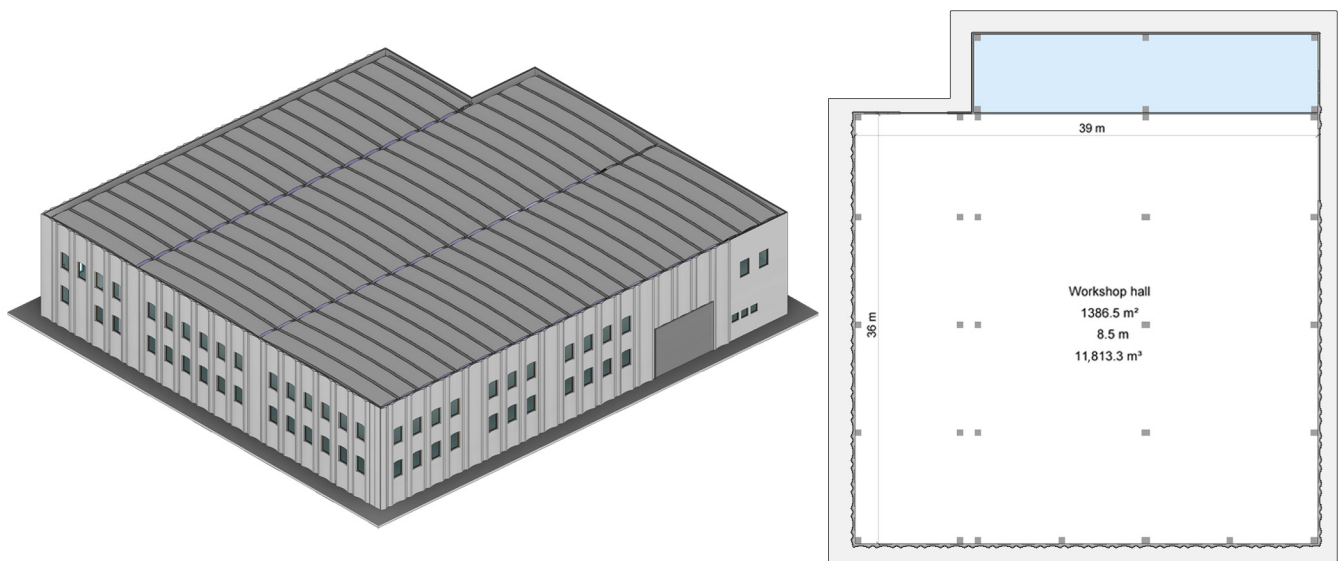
Three-dimensional model of the analyzed industrial building and ground floor plan. The blue area indicated in the internal layout is not addressed because it hosts a warehouse and archive on the ground floor and offices on the first one.
